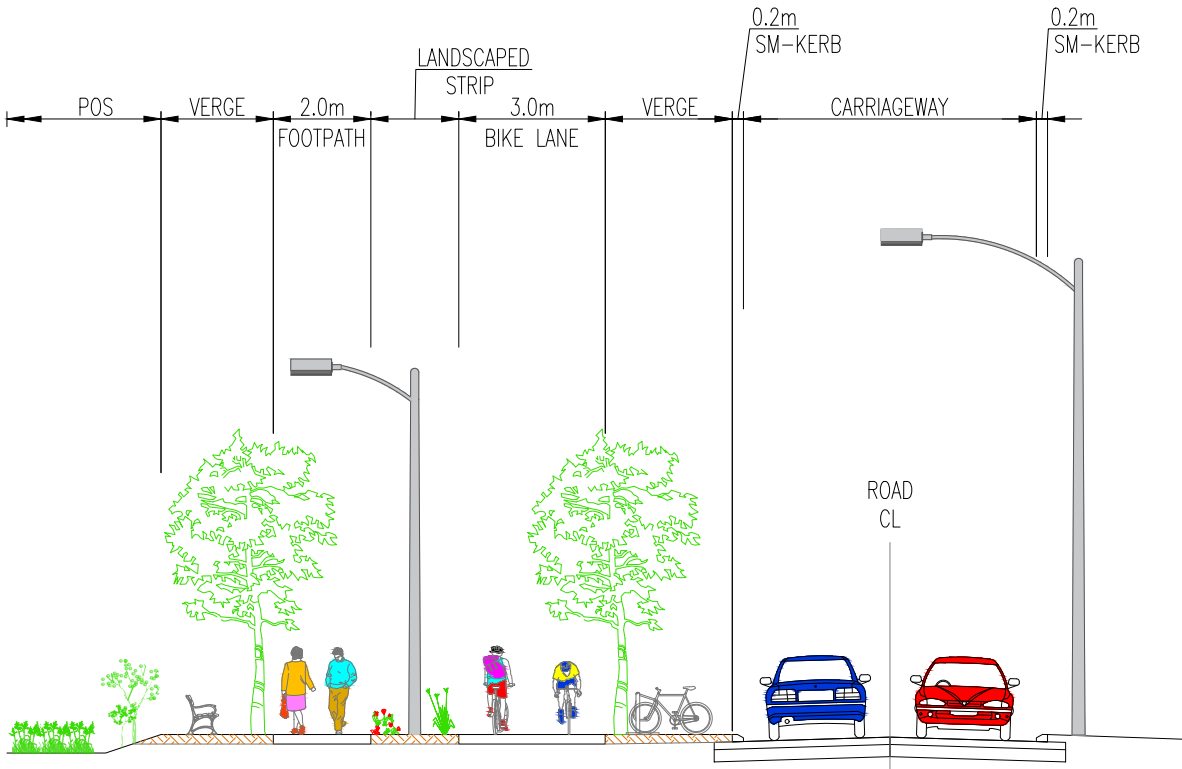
CROSS SECTION LINK ADJOINING POS AND A ROAD
